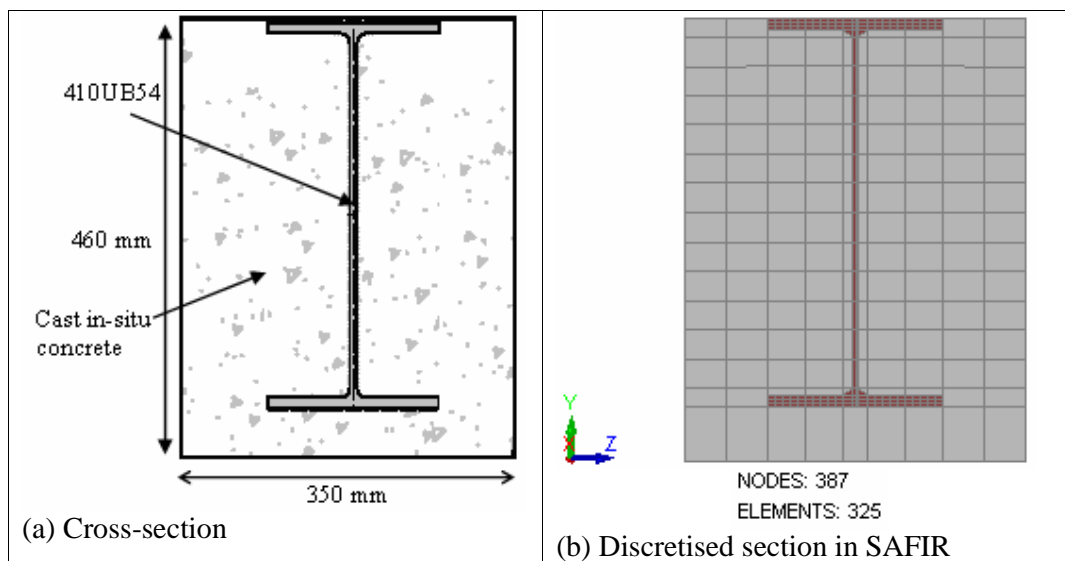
Cross-section and discretisation of steel columns encased in concrete
